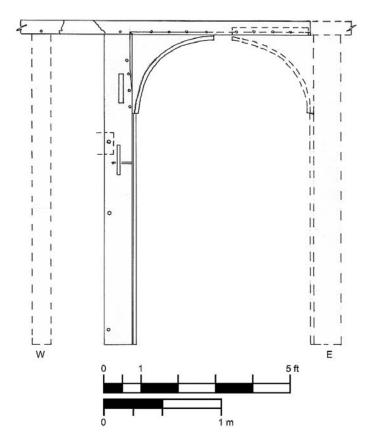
The 15th-century door arch inside Rebow House, 58, 60 and 62 Head Street (corpus no. 31).
